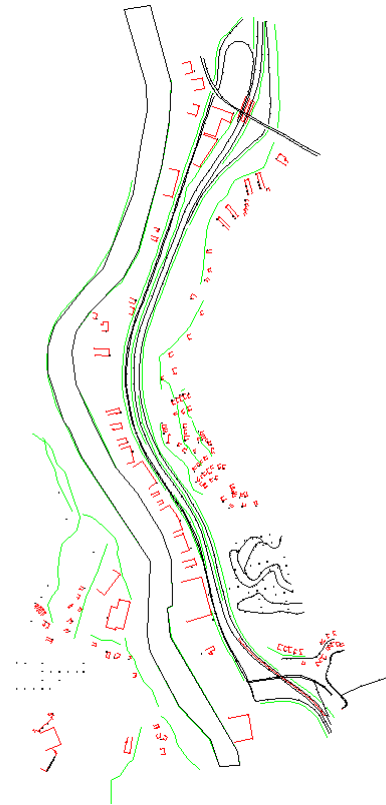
2015 Existing, Section B (B2.1) and 2040 No-Build, Section B (B2.1)
